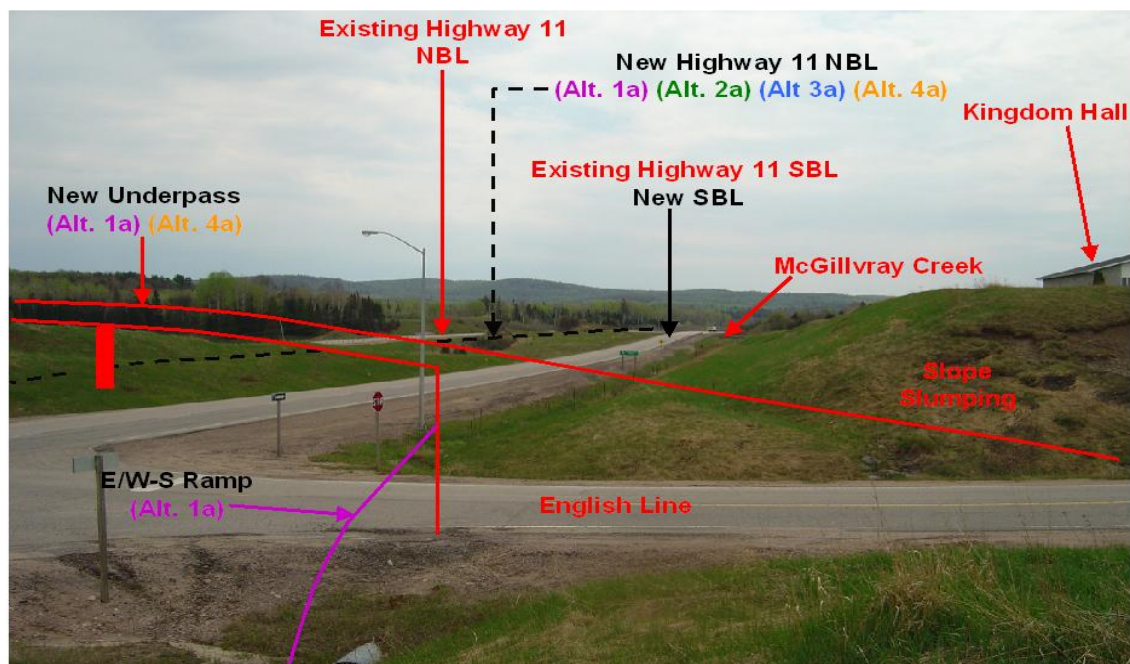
View looking west from Loxton / English Line about 200 m east of Highway 11 NBL. McGillivray Creek in foreground. At-grade crossing in 4 to 5 m earth cut. (May 8, 2007)
